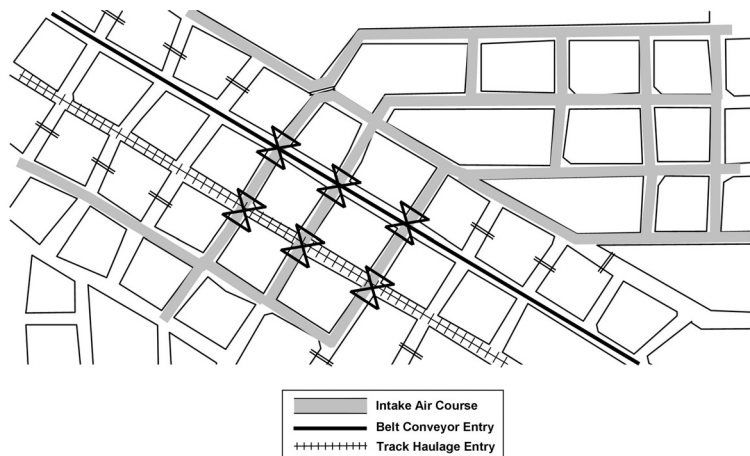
Six Overcast Alternative to Eliminate Equipment Doors
